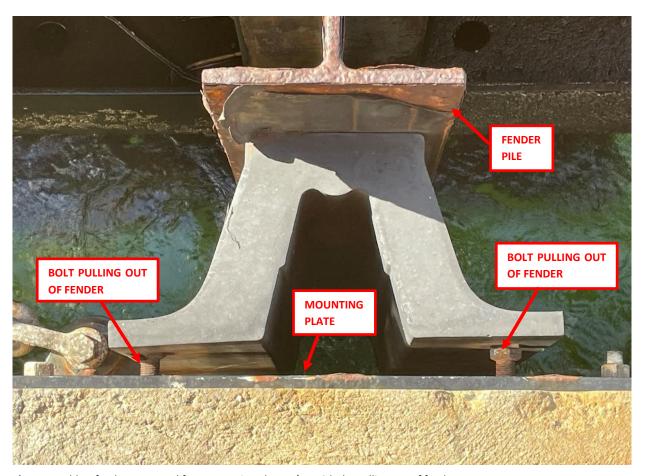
Rubber fender separated from mounting plate w/ top 2 bolts pulling out of fender.
